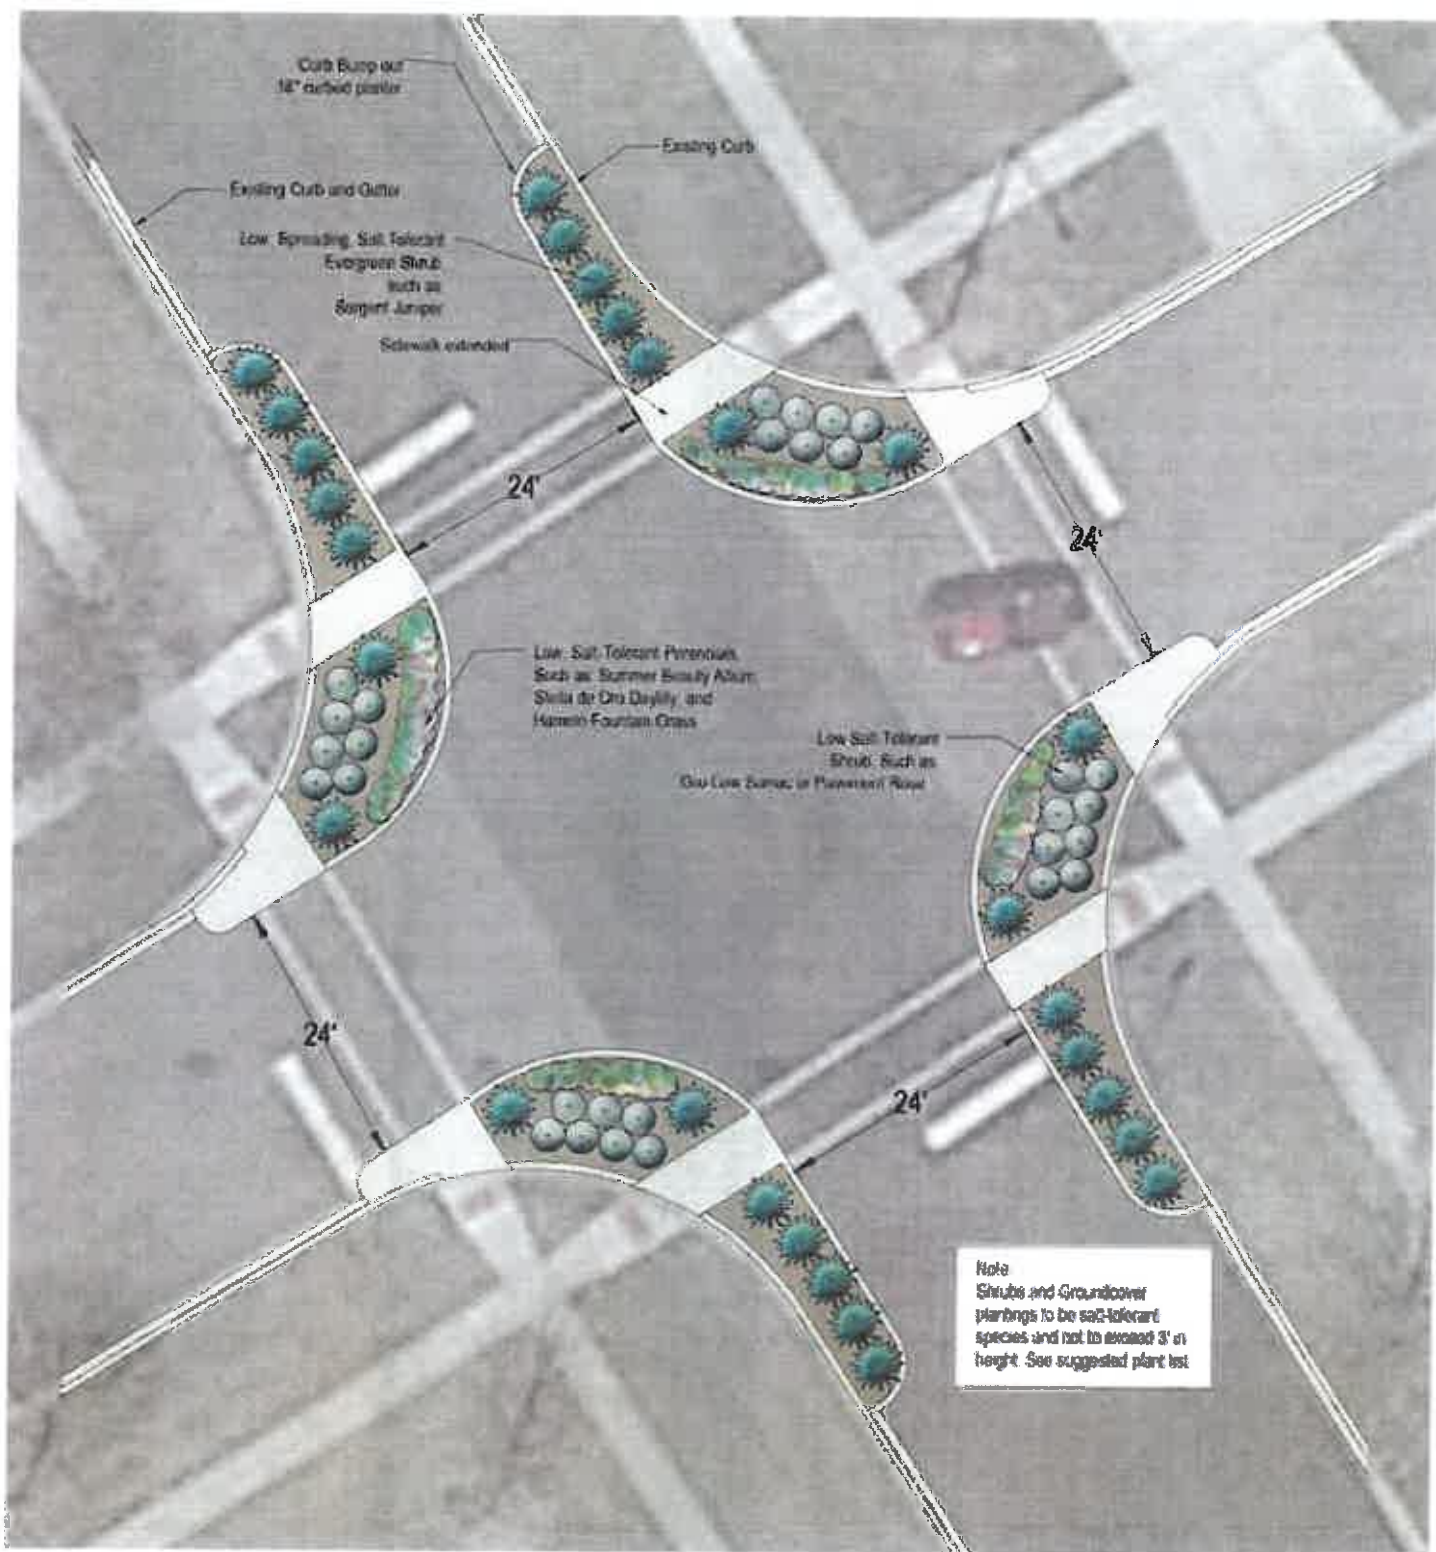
CURB EXTENSION CONCEPTUAL PLANTING PLAN
